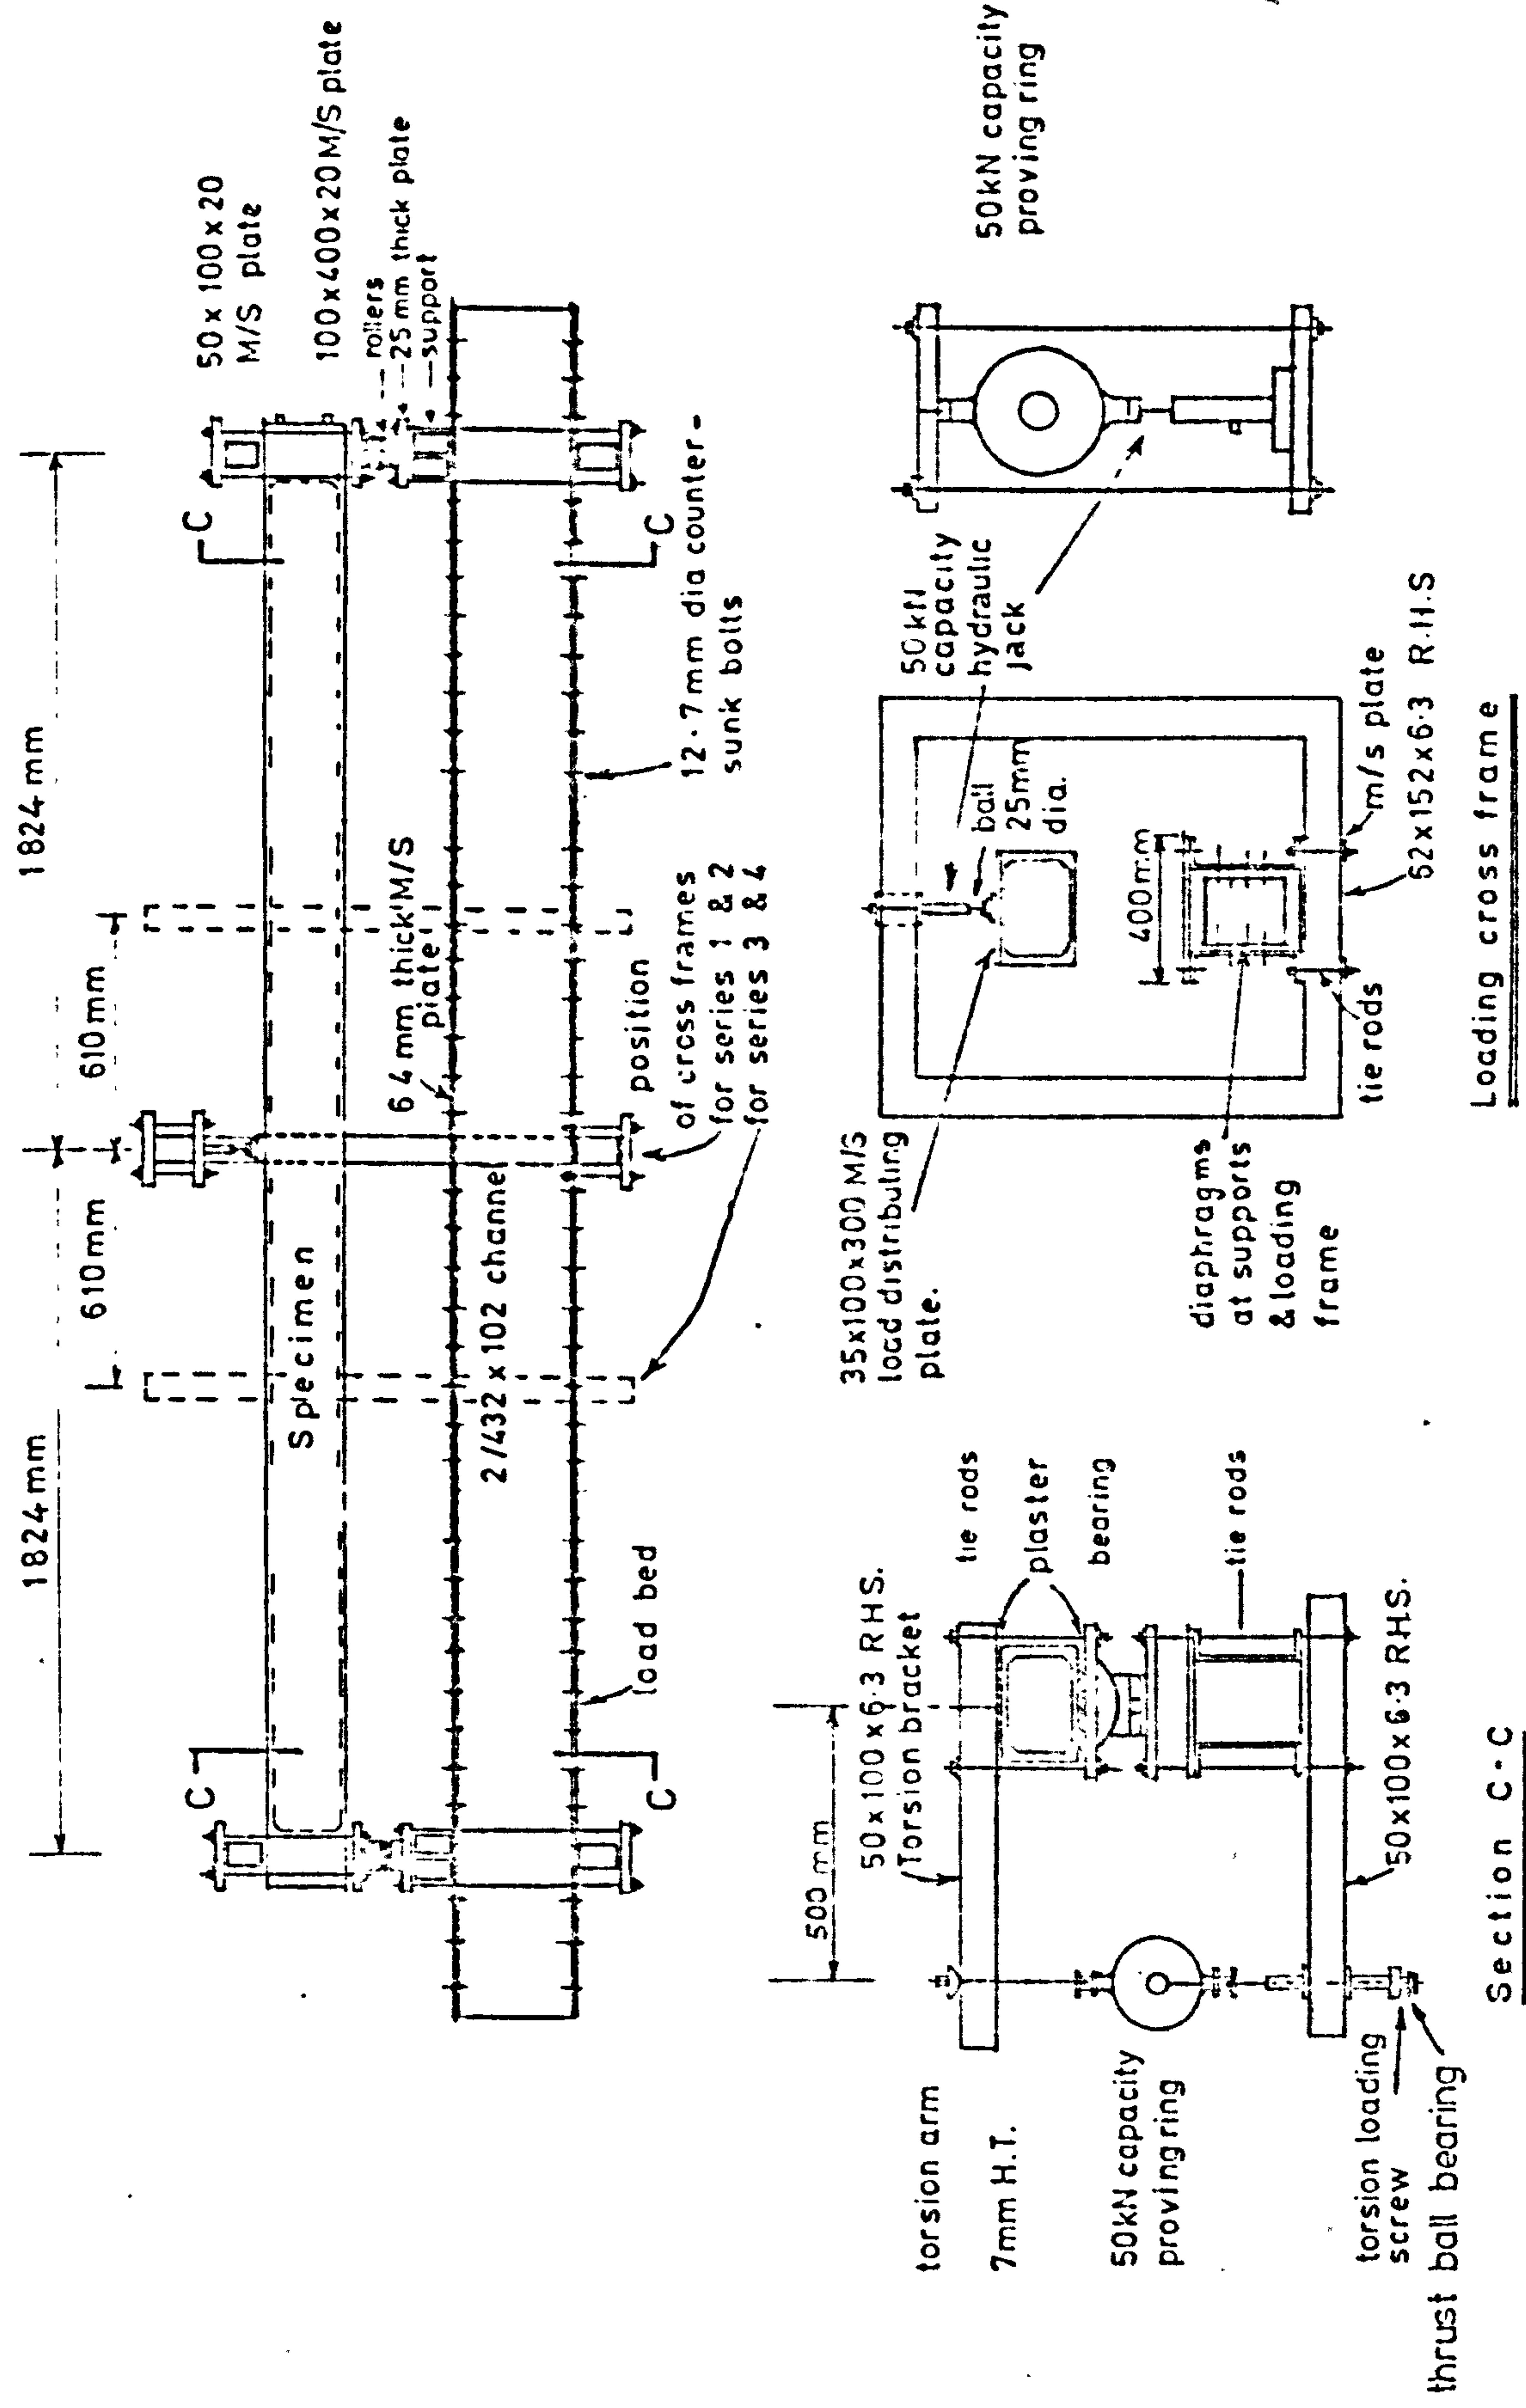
TEST RIG AND LOADING ARRANGEMENT
